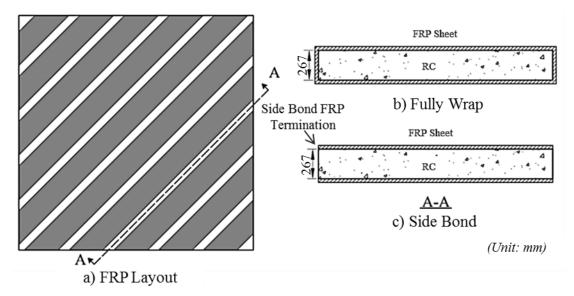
Layout and wrapping method of FRP sheets, a) FRP layout, b) Fully wrap, and c) Side bond wrapping scheme cross sections
